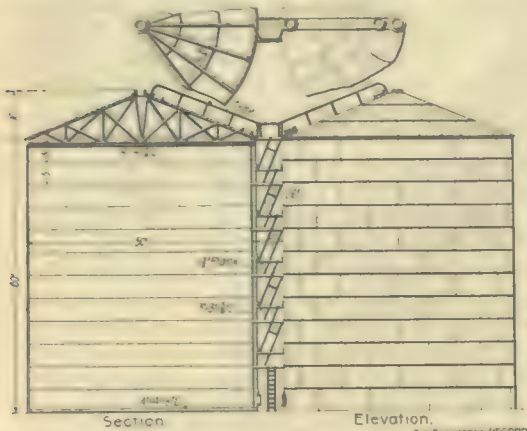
CONSTRUCTION OF ELEVATOR TANKS.
